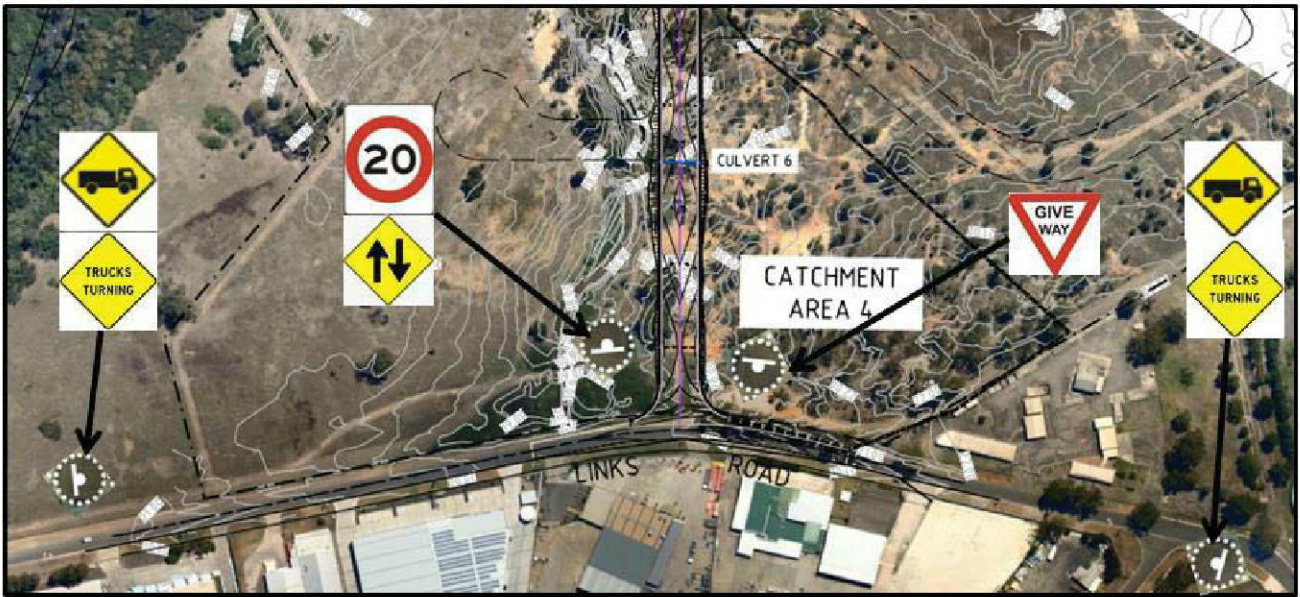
Proposed Temporary Signage Plan (Indicative)
